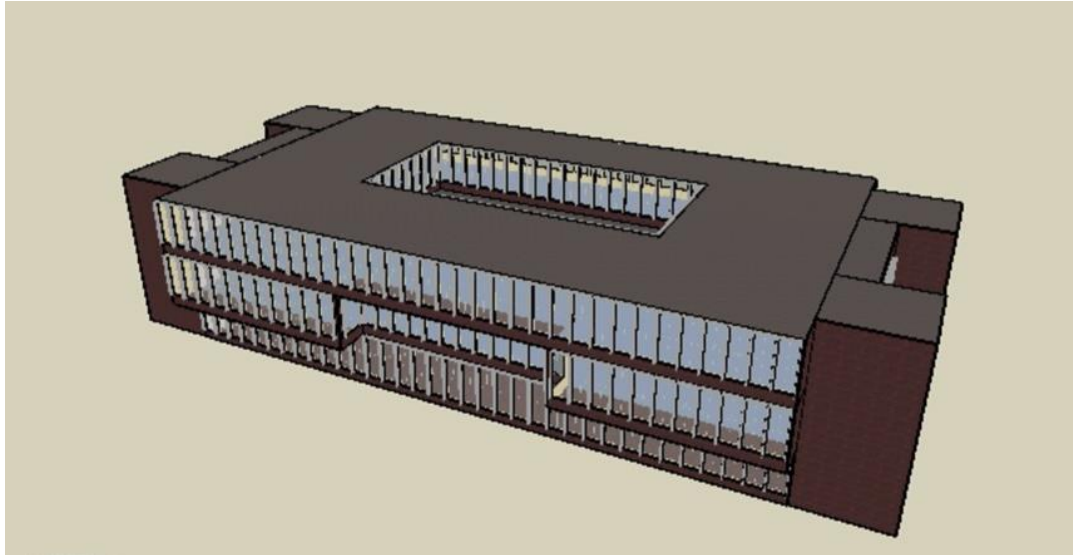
Model of Civil Engineering building constructed in Design Builder.
